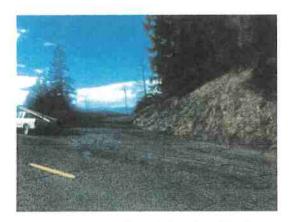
Photograph showing the access of Road 2 from Road 1. The access is paved and is equivalent to a category IV road.
